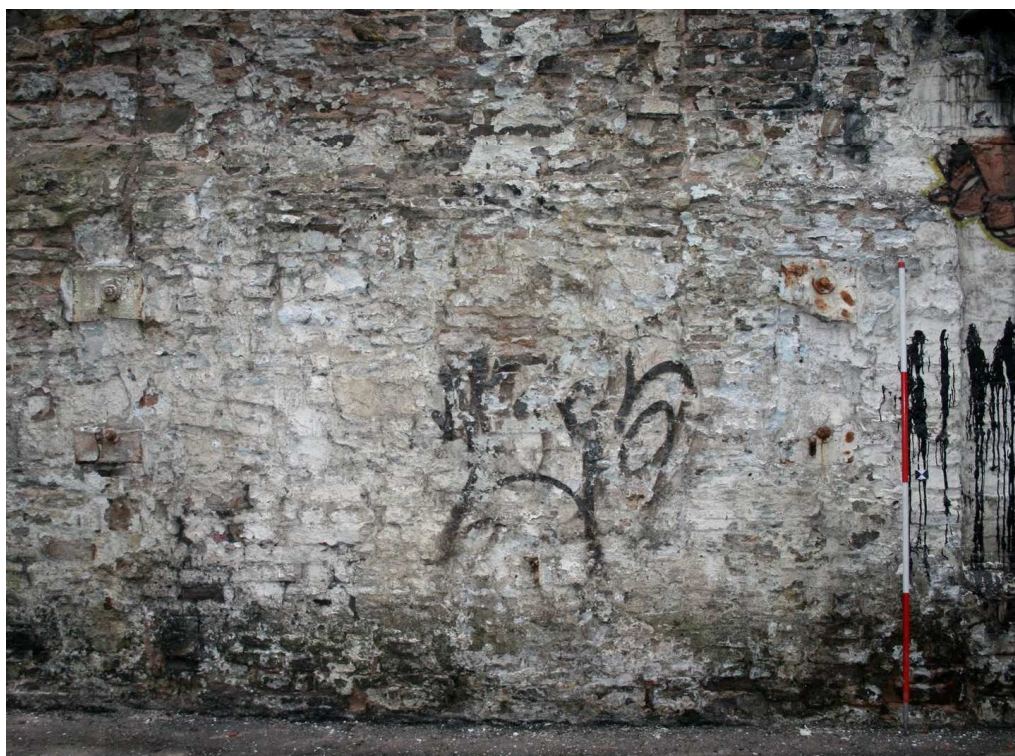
Broken cast-iron wall brackets, north elevation, Building I
